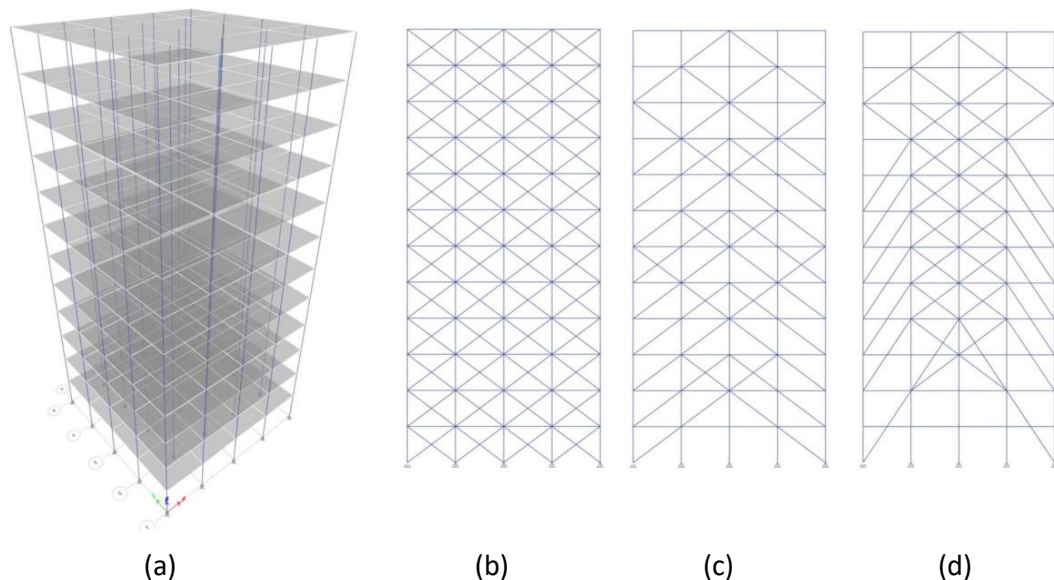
a) 3D perspective view of the building's numerical model developed in ETABS 18.1.1, b) X-braces structure (MRBF1), c) layout of FSTO for simple GS (MRBF2), d) layout of FSTO for $r = 8m$ (MRBF3).
